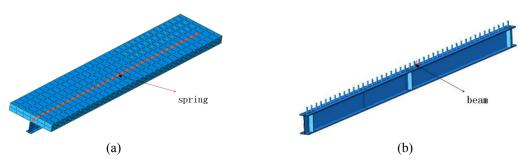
Simplified FE models for steel-concrete composite beams using (a) spring elements; and (b) beam elements for studs
